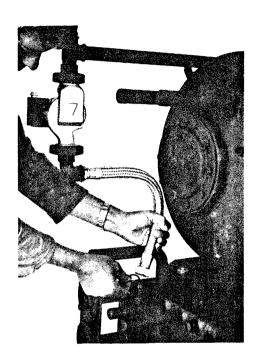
Connect flexible pipe with Tee connection of heating return pipe. Make sure no sharp bends will obstruct the flow.
